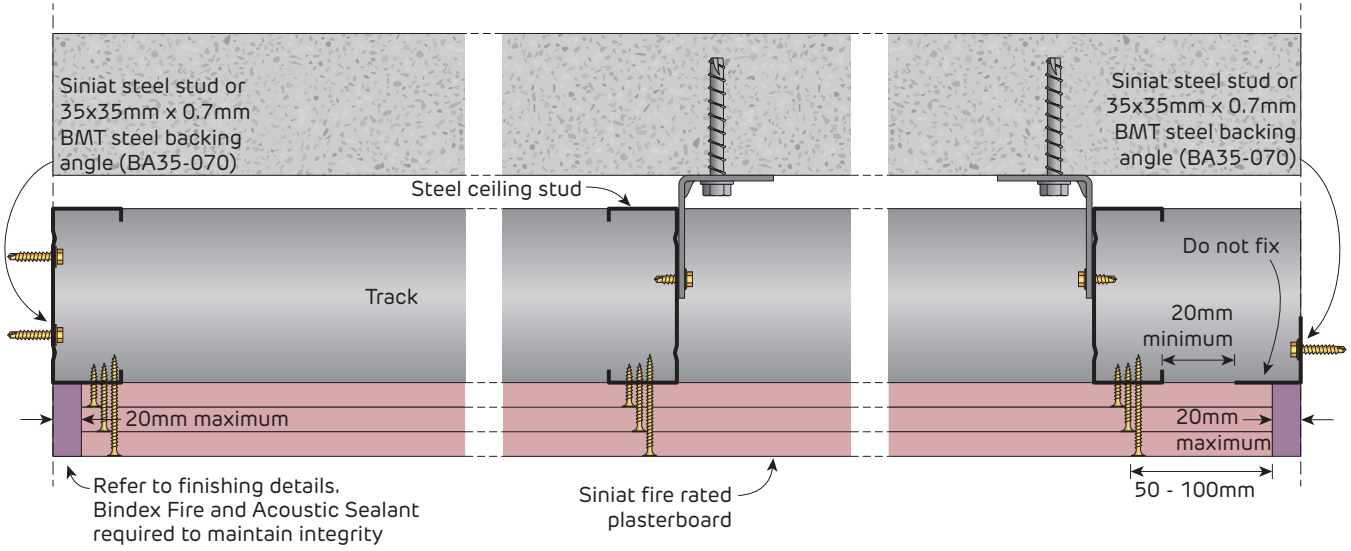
Stud Ceiling Type A4 - Fixed / Sliding
